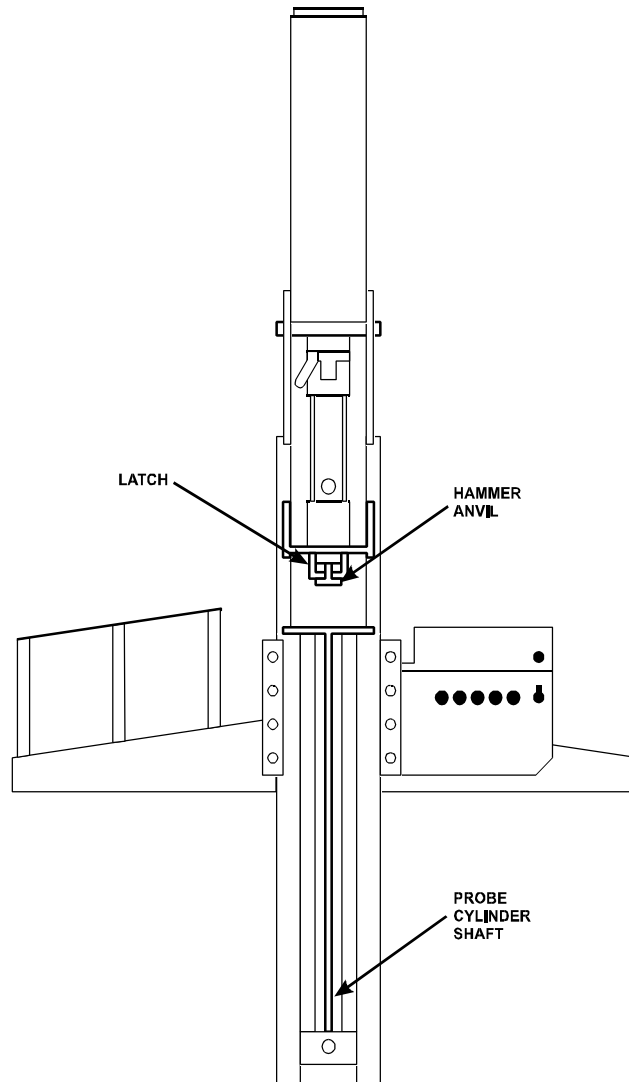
Geoprobe™ Setup for Drilling Through Concrete and Pavement
